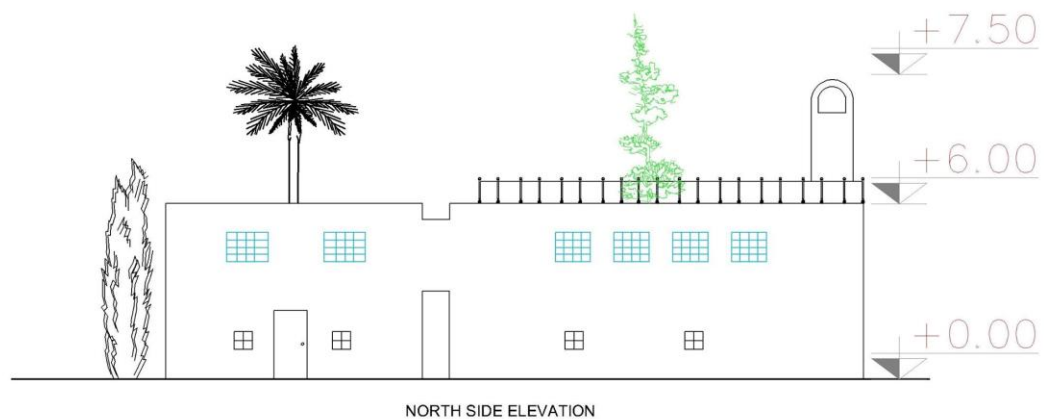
10 North-side elevation of House One (Movahedi 2016)
